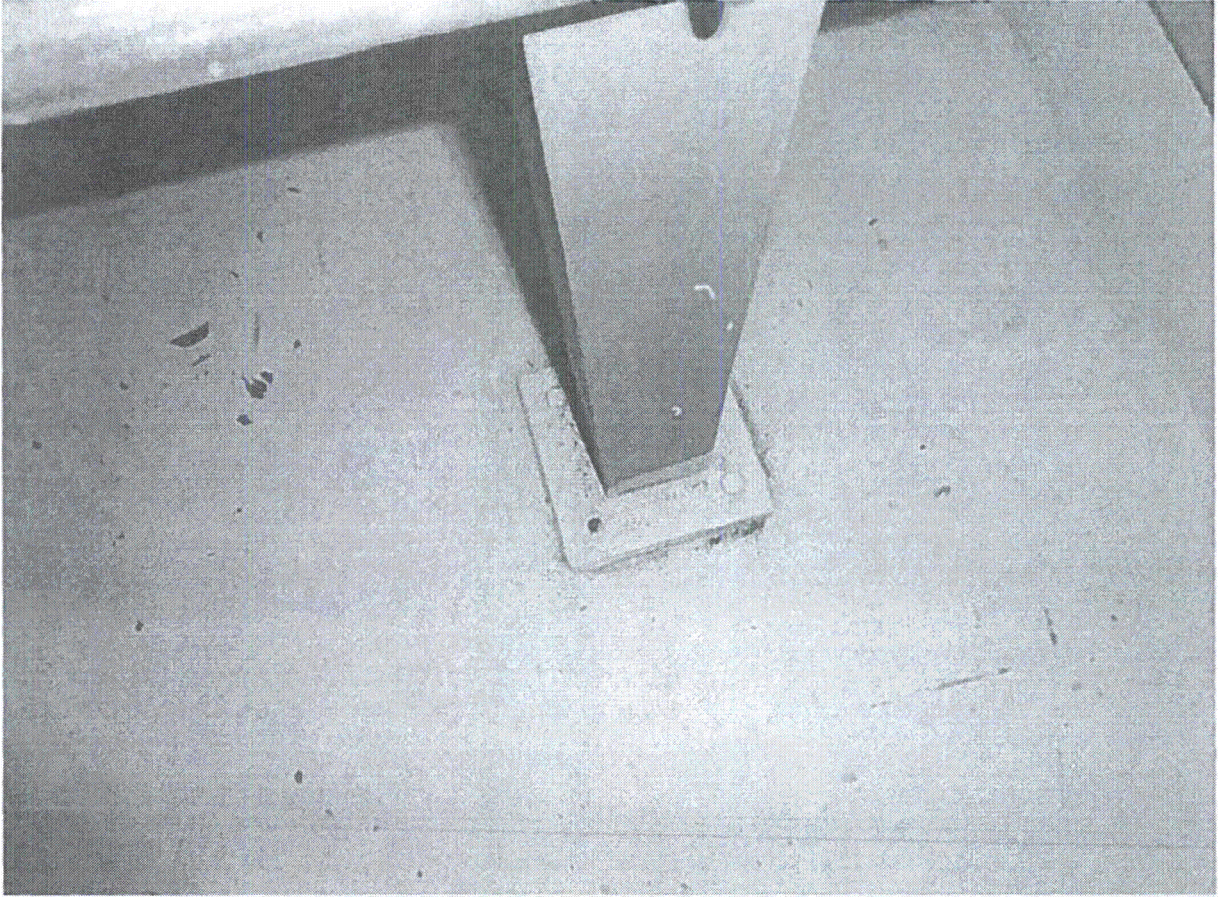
Conduit support in Torus Room Bay 10 with Missing Anchor
